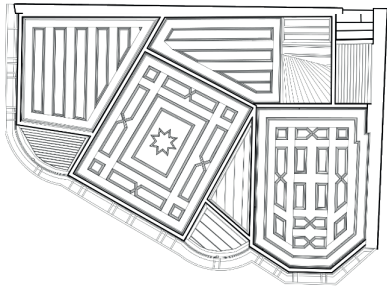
Sections. Rearranged by the author based on the drawings of N. Unal, 2014
